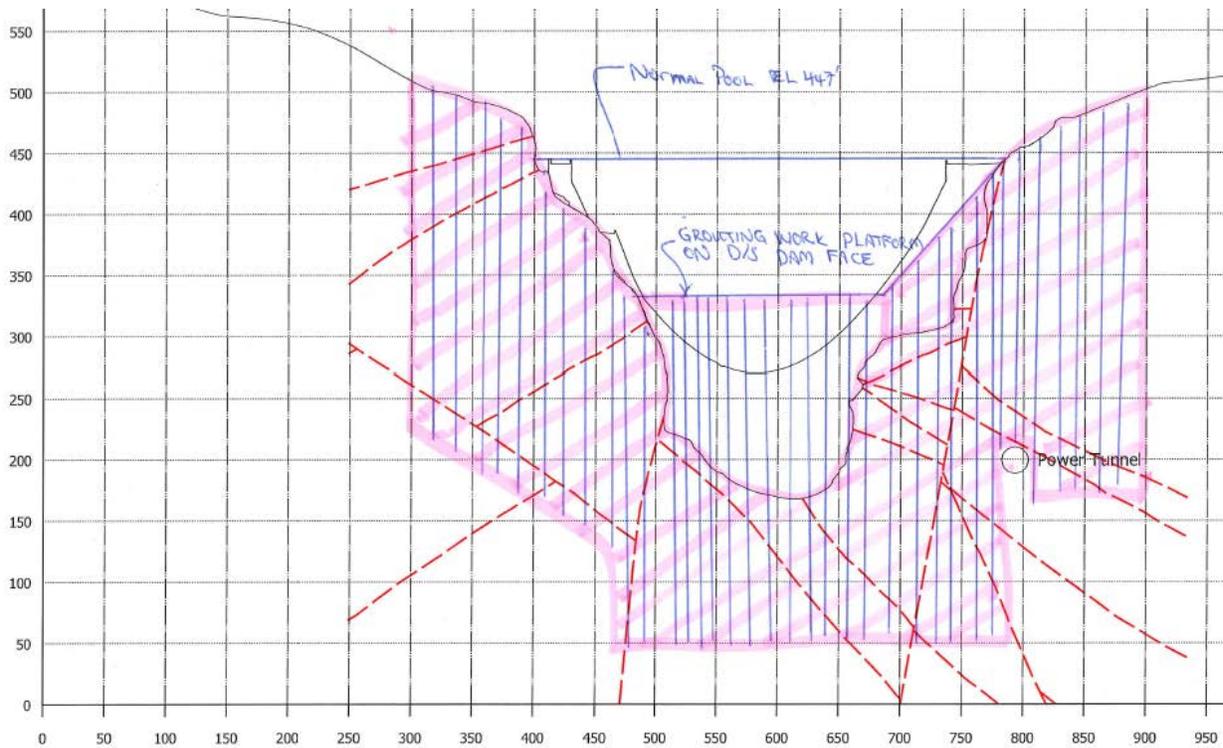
E-1: Grout curtain drilling through dam from downstream dam face, plan view
